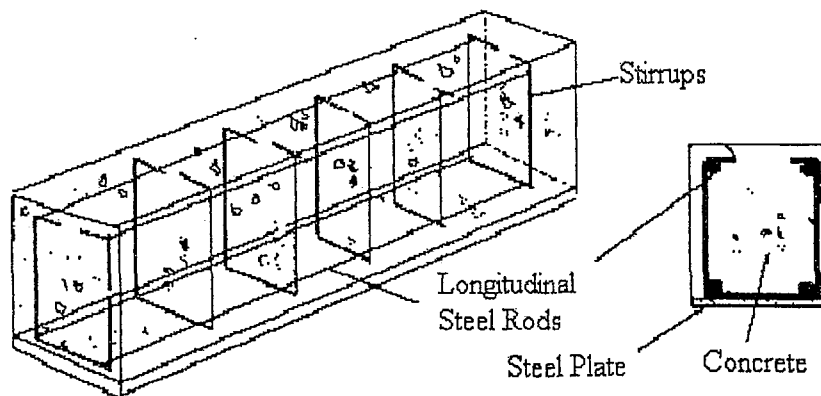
(b) Steel plate-stirrups assembly with longitudinal reinforcement (Hossain 1999)
